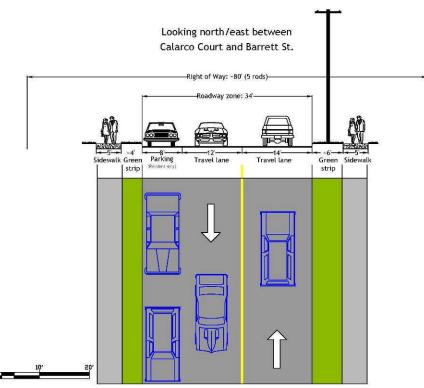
Typical roadway cross section between Calarco Court and Barrett Street
